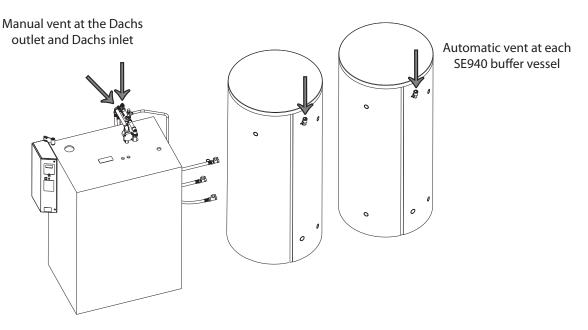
Hydraulic vent positions at the Dachs Pro 20 ST
